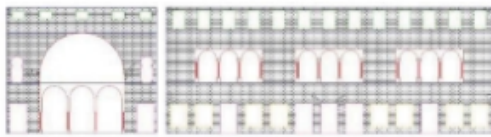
Minor cracks visible in Masonry wall on the ground floor and first floor.
